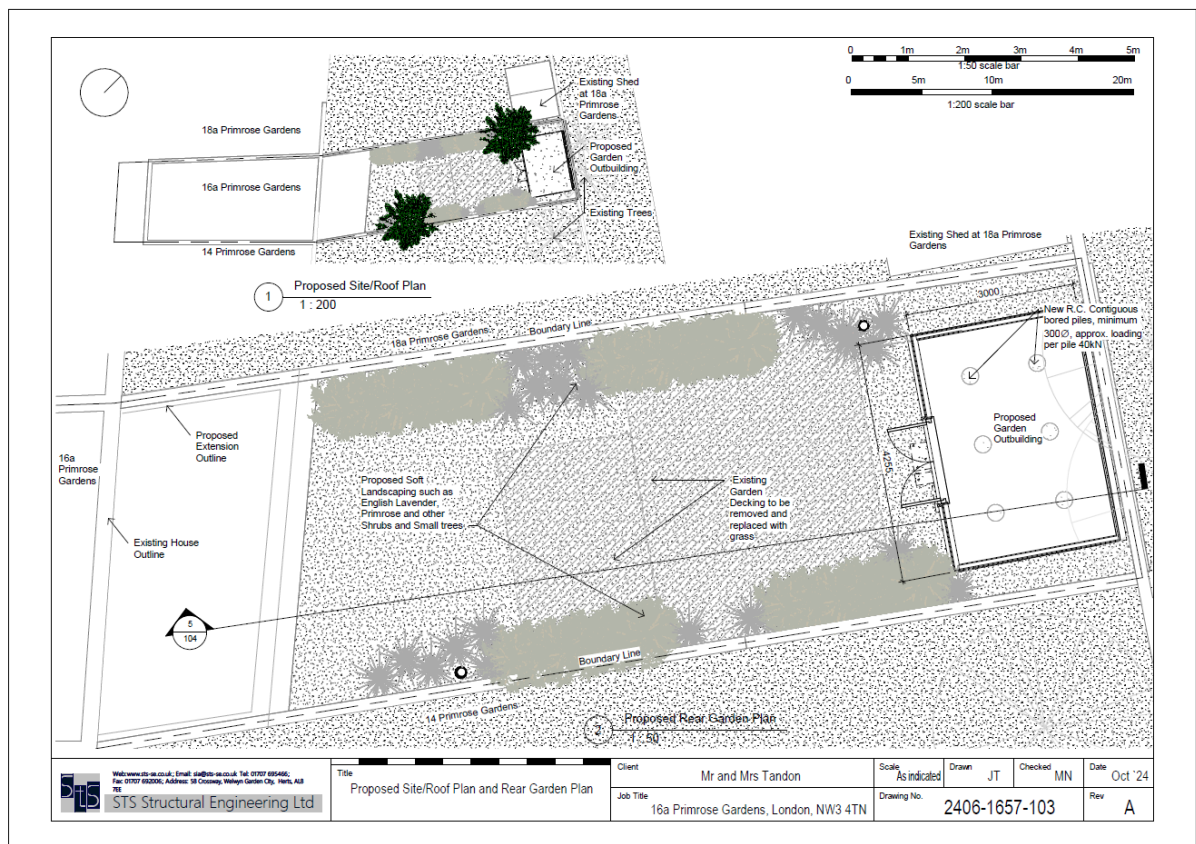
Proposed site plan and rear garden plan (Source: submitted drawings)
